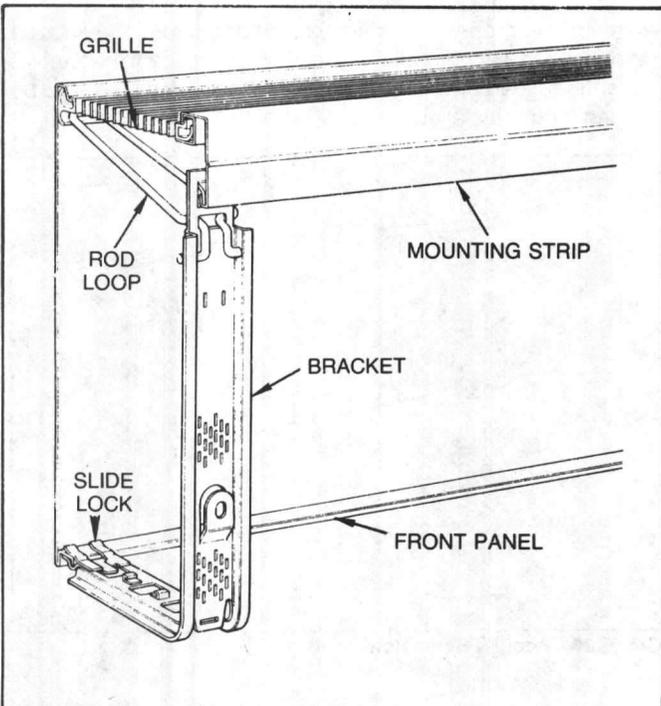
Type TA Enclosure Mounting Detail (View from Rear)
